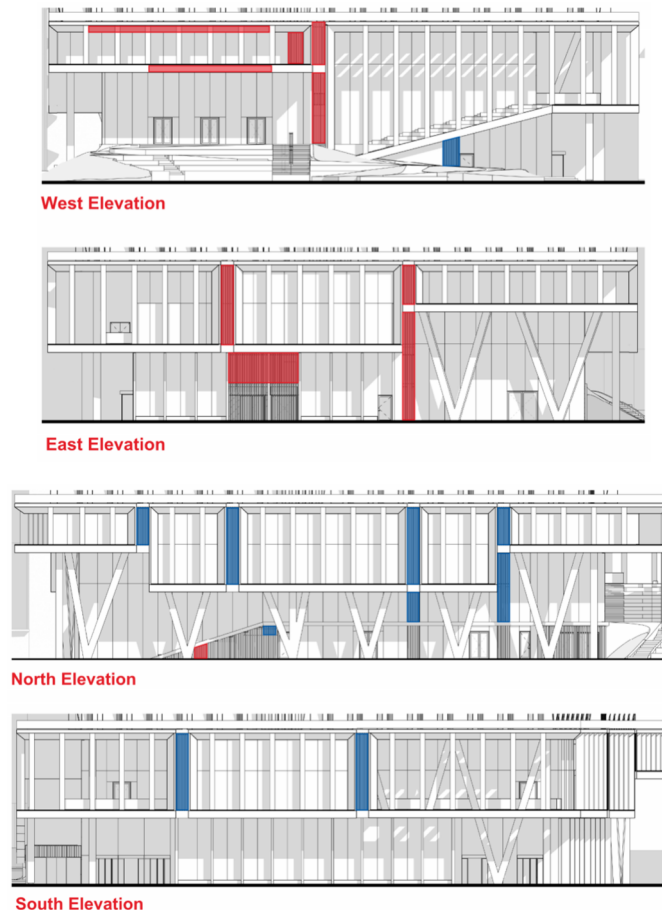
Location of louvres on each elevation of the Podium (Exhaust in red, Intake in blue)
